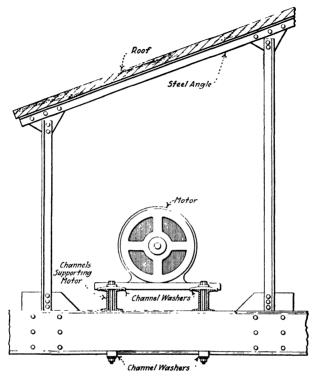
Motor mounted on channels clamped to structural-steel roof truss.
